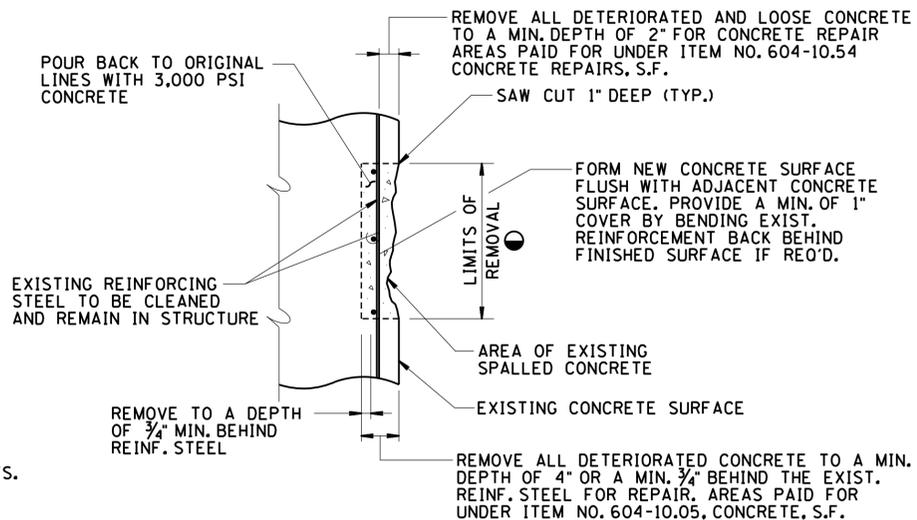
DETAIL SHOWING AREAS OF EXISTING SPALLED CONCRETE SURFACES TO BE REMOVED AND REPAIRED
